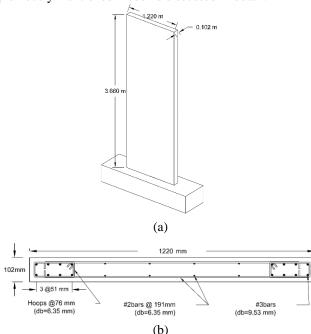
RW2 Specimen Geometrical Dimension (b) cross section details [25]
